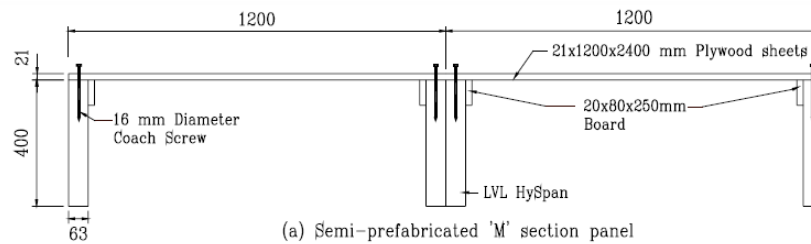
Prefabricated Timber “M” Panels, UC Arrangement
